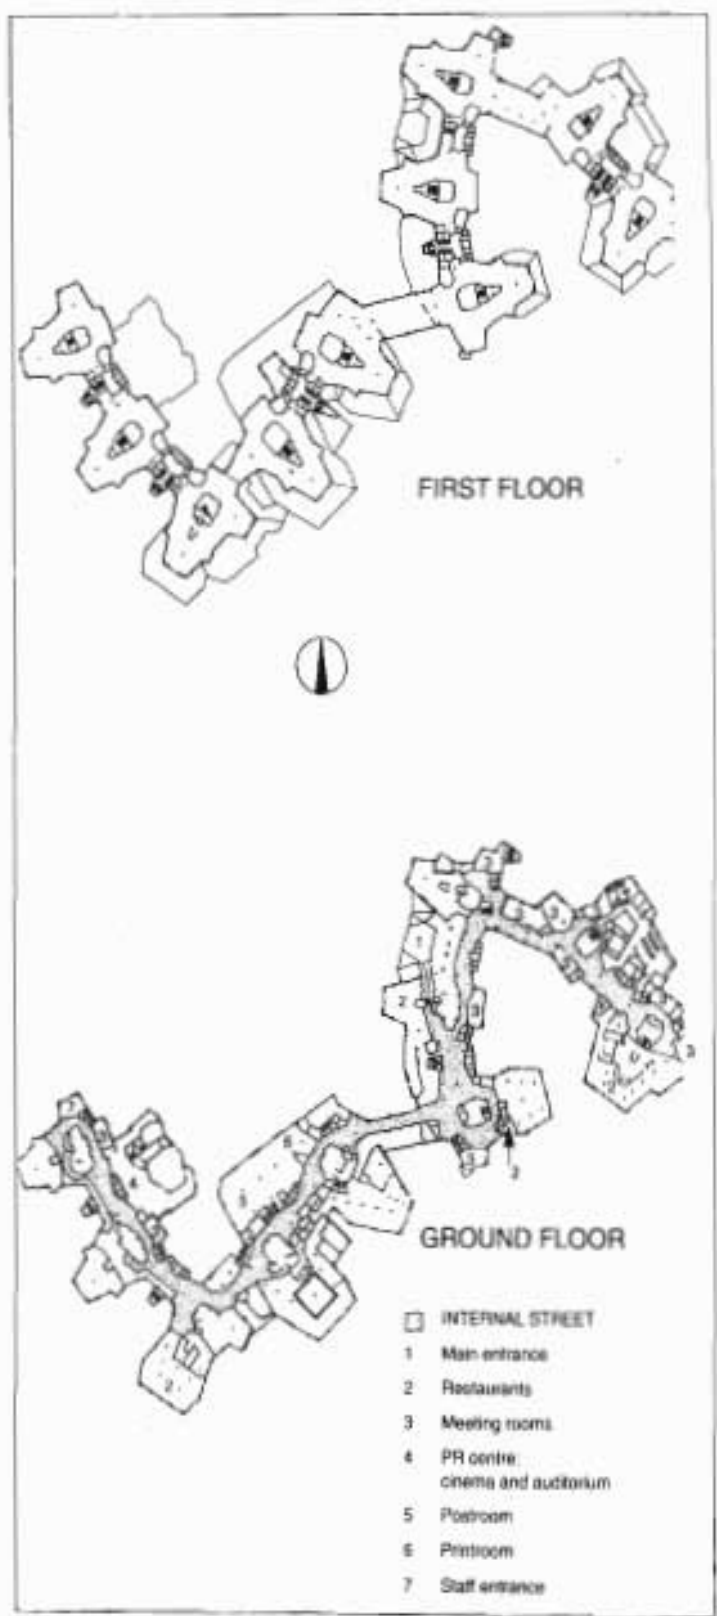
Ground and First floor plans (Vale & Vale 1991:55)
